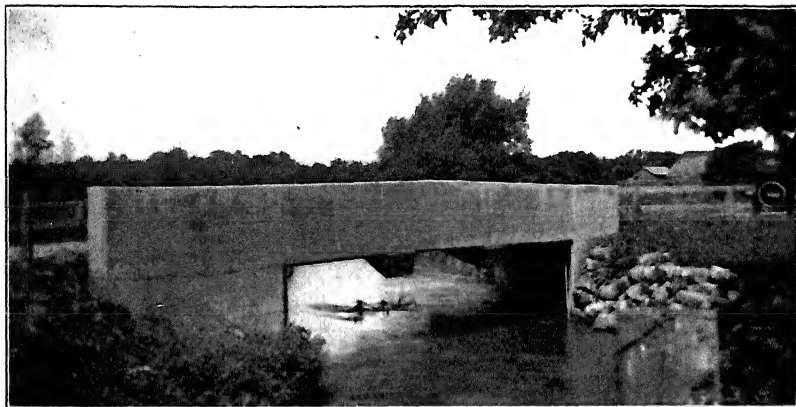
Parapet girder bridge (concrete). High class road. Span 25 ft. Width of roading 22 ft. Approximate cost (1920) \$5000. Actual cost (1914) \$2300.
